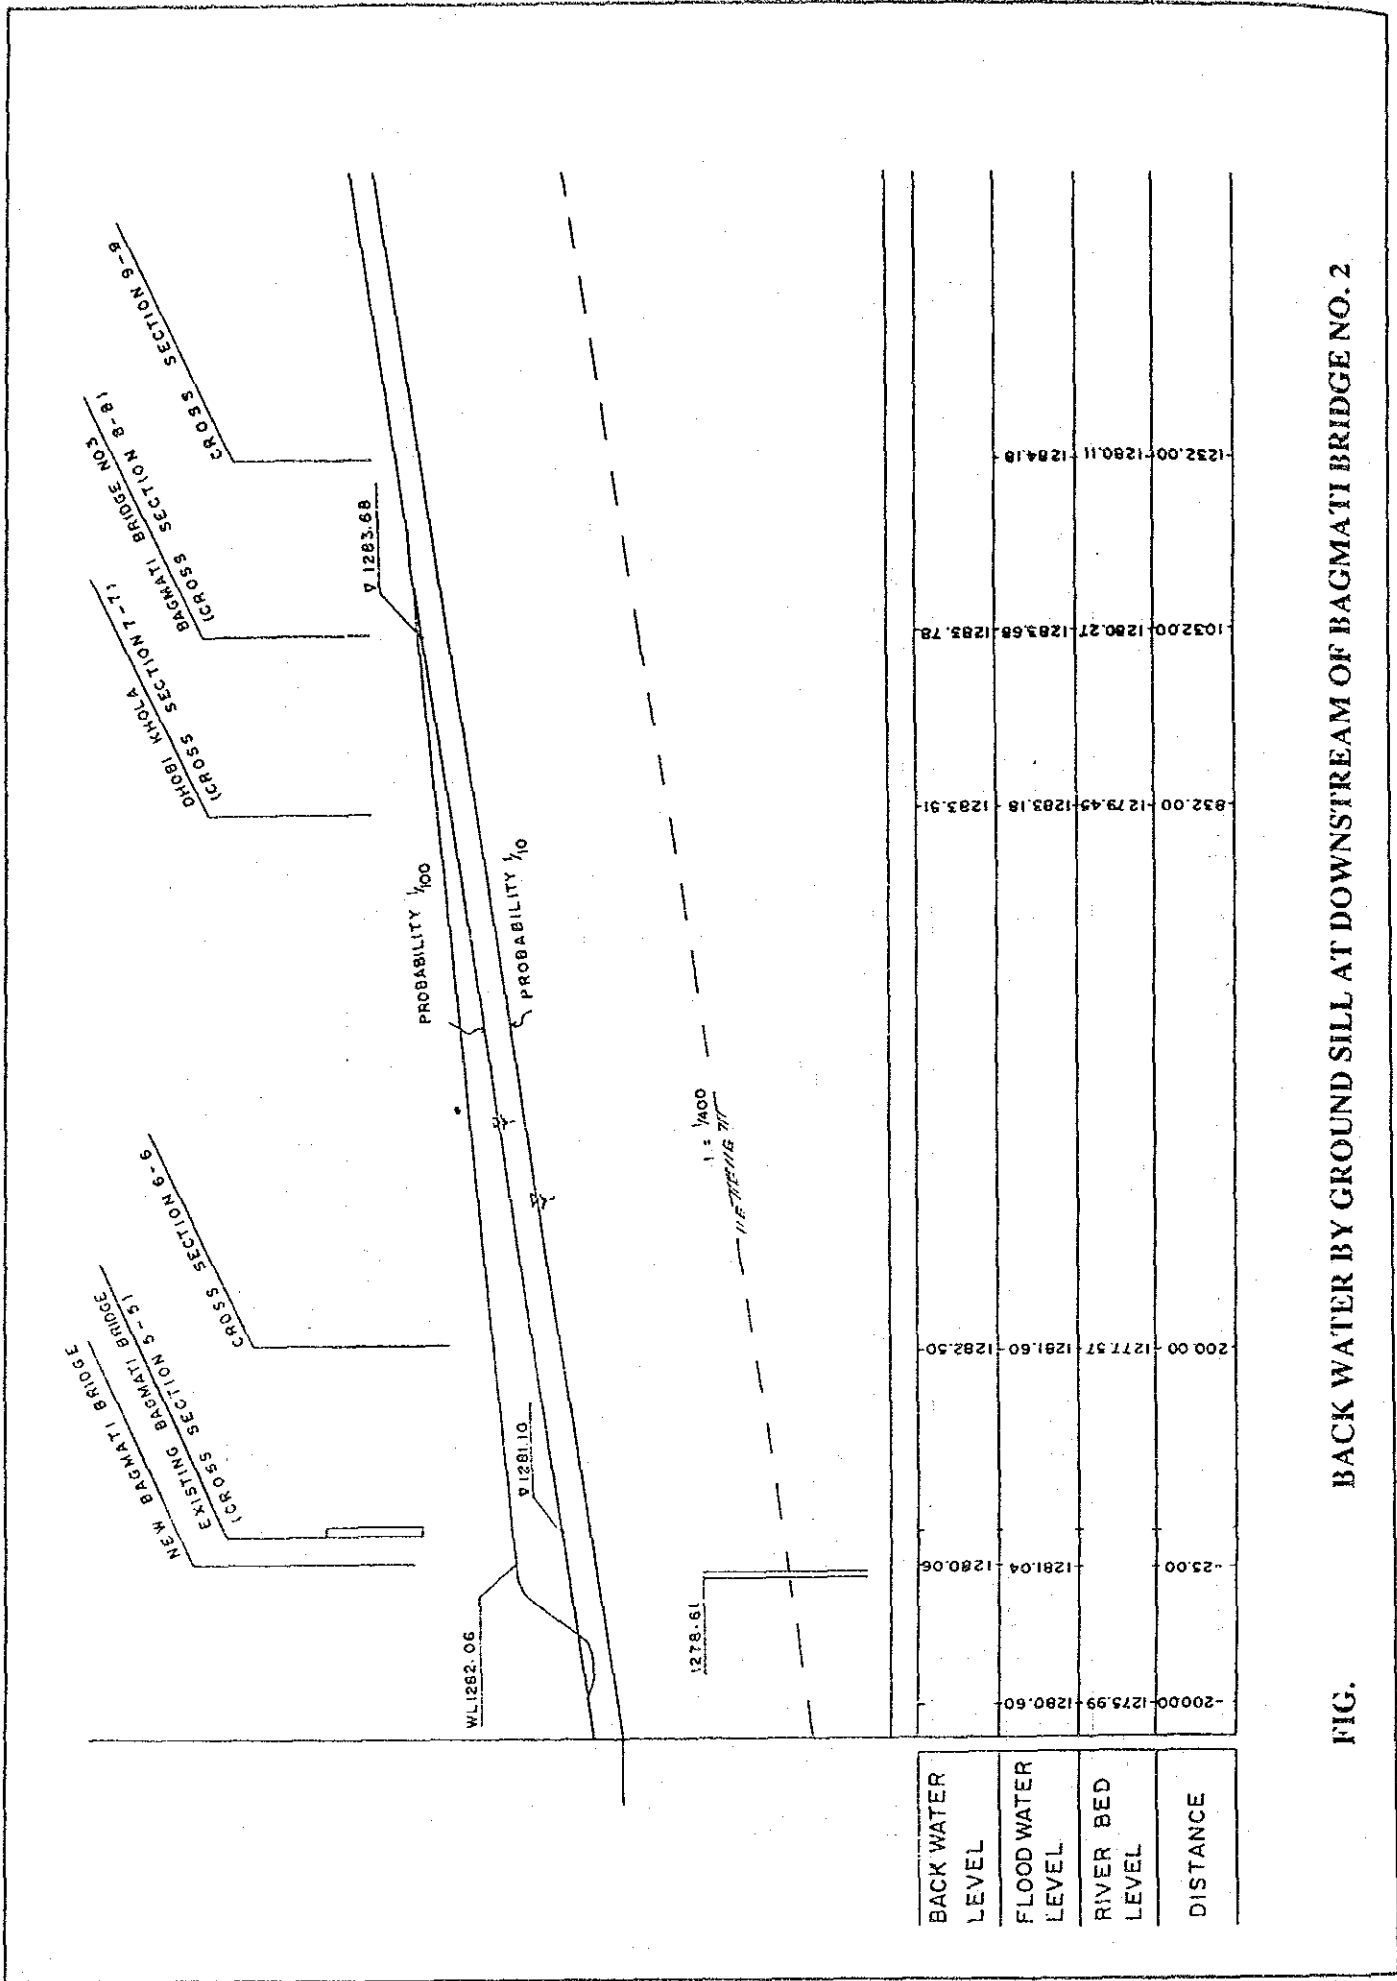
FIG. BACK WATER BY GROUND SILL AT DOWNSTREAM OF BAGMATI BRIDGE NO. 2
